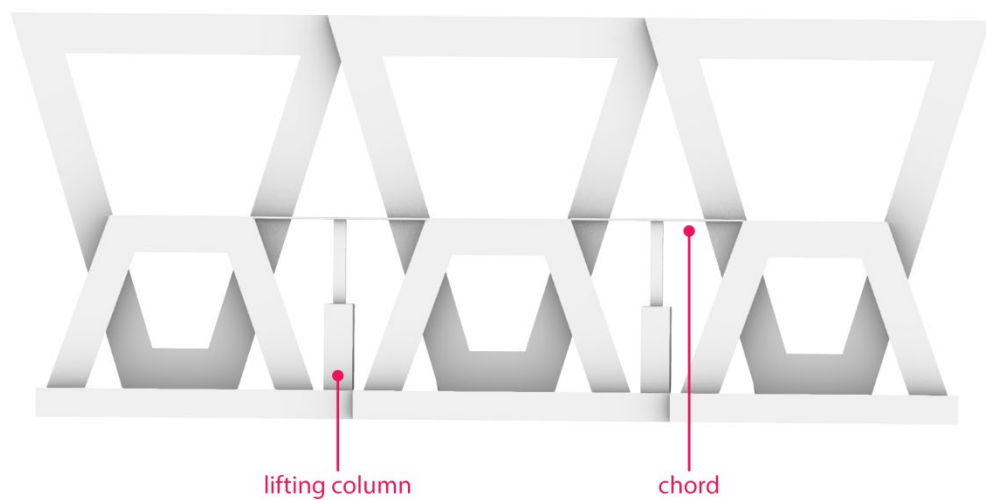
Lifting mechanism for ramp segments (side elevation, example segments)
